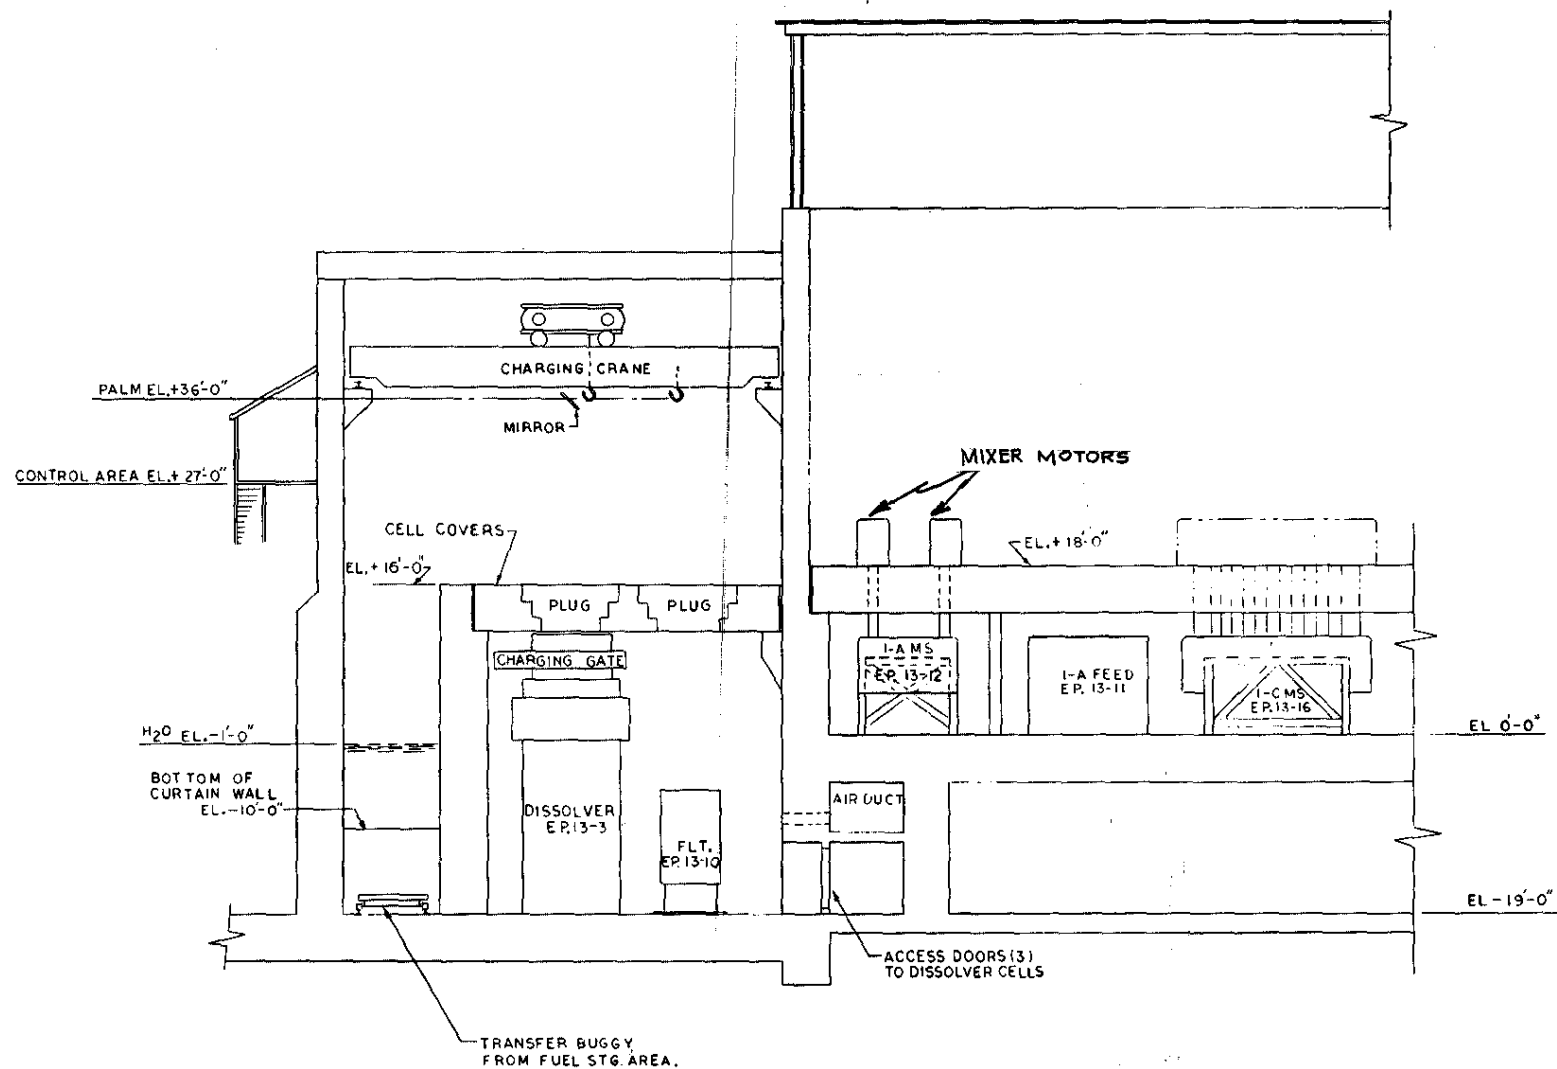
CASE VII - BUILDING NO. 13 SECTION - SHEET 2
